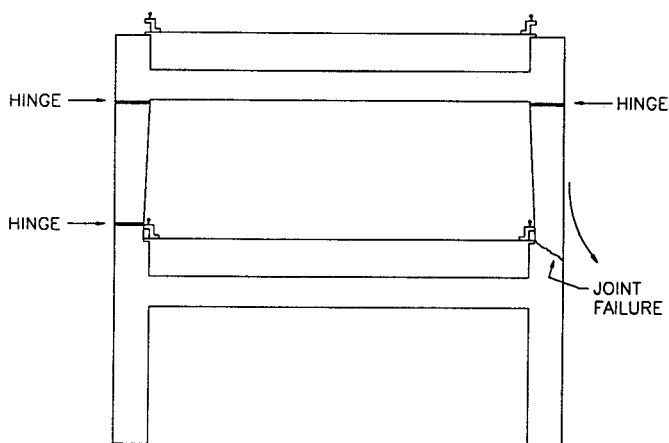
I-880 highway schematic cross section, structural concept, and location of initial failure.
